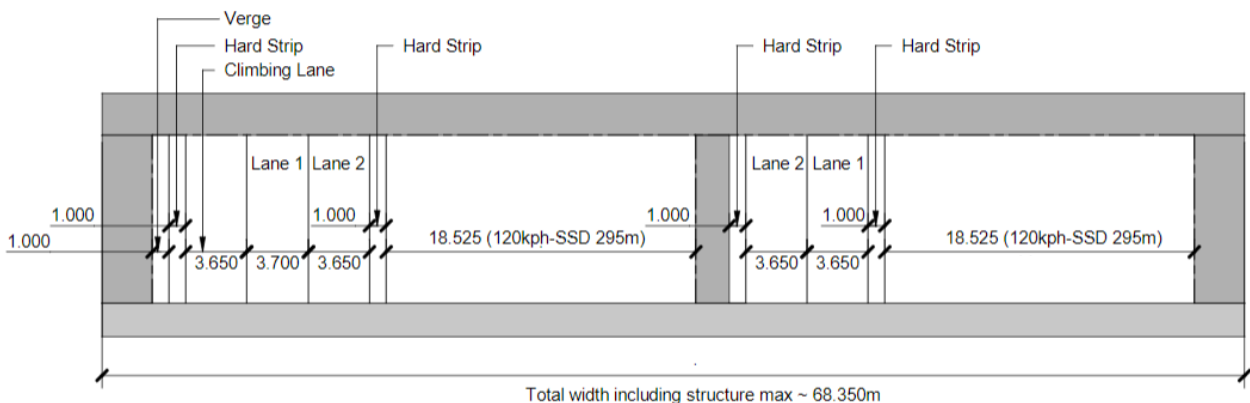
Assumed typical carriageway cross section for cut and cover tunnel
